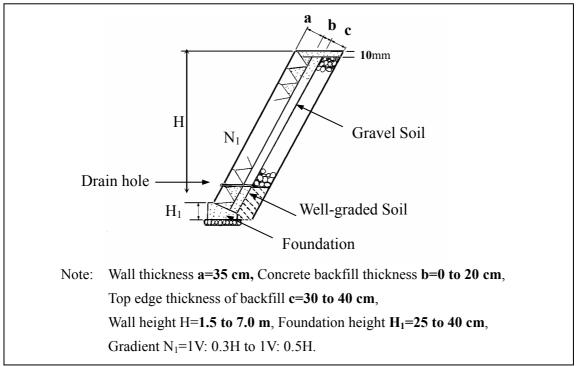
Detail of Stone or Concrete Block Retaining Wall
